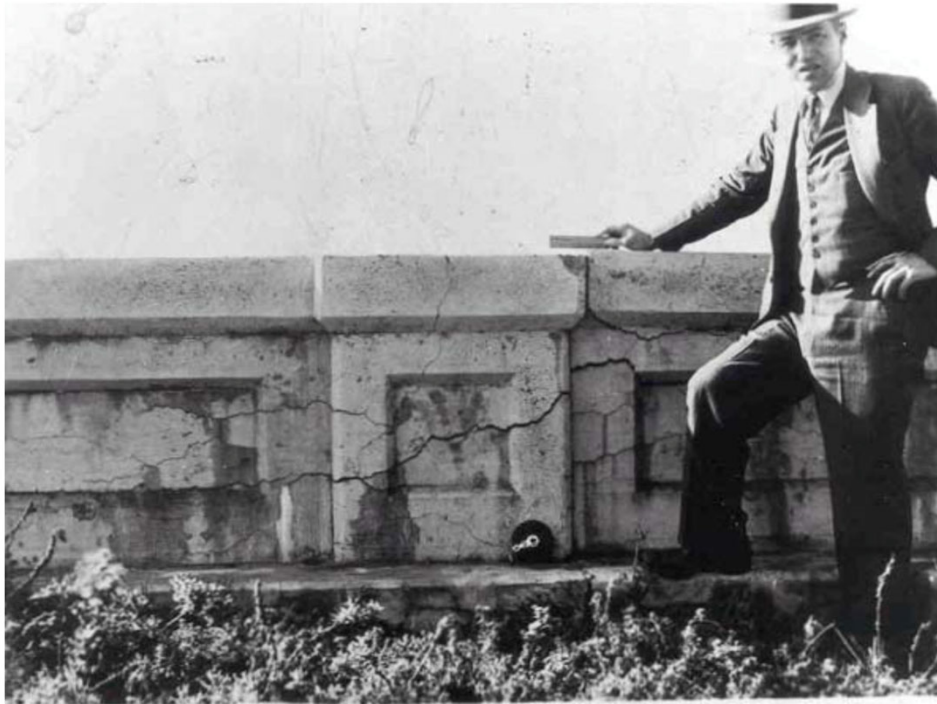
Thomas Stanton of the California State Division of Highways and a Bridge Parapet Wall that is Showing Signs of Damage due to Alkali-Silica Reaction
